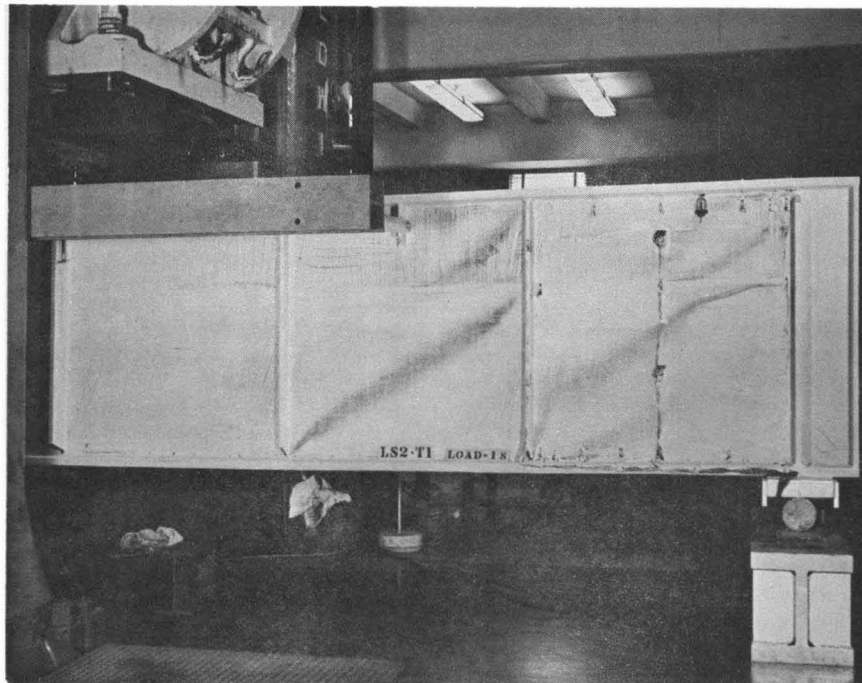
Girder LS2 at Load No. 18 (- x end)
